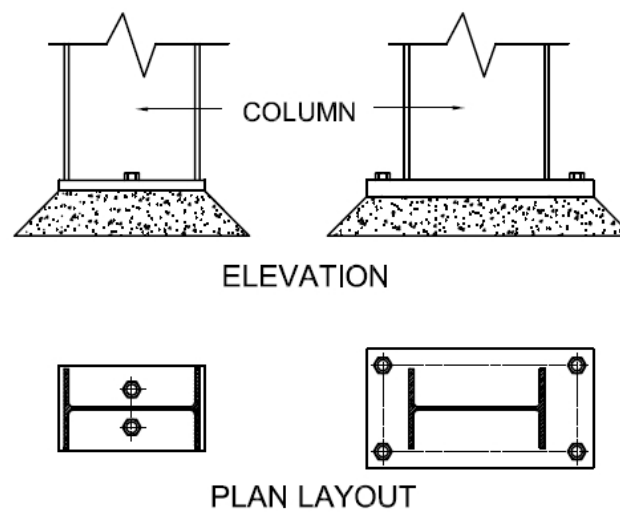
Elevation layout of typical pinned and fixed column bases.
